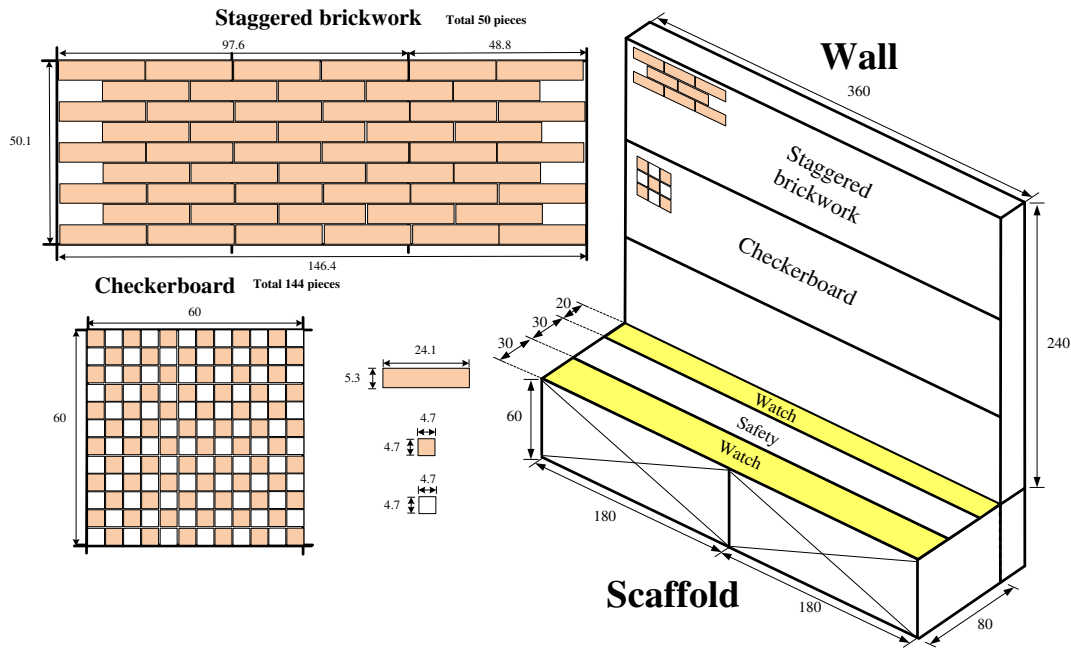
Scaffold, tiling wall, and tile patterns (unit: cm).
